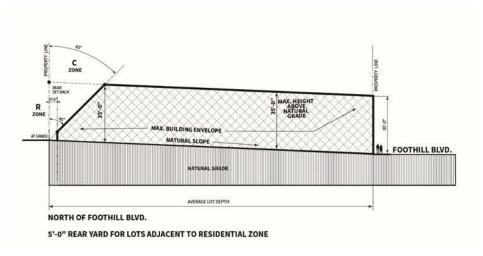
B: BUILDING OR STRUCTURE HEIGHT
